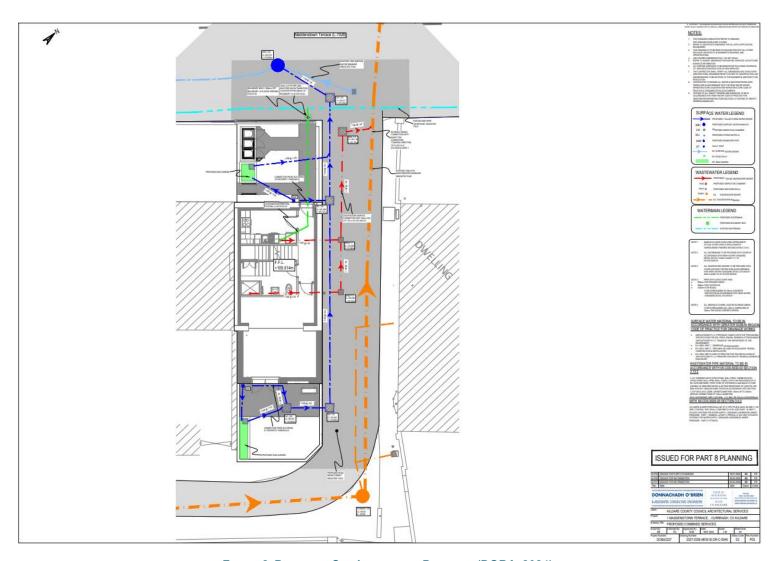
PROPOSED SITE LAYOUT AND DRAINAGE (DOBA, 2024).
